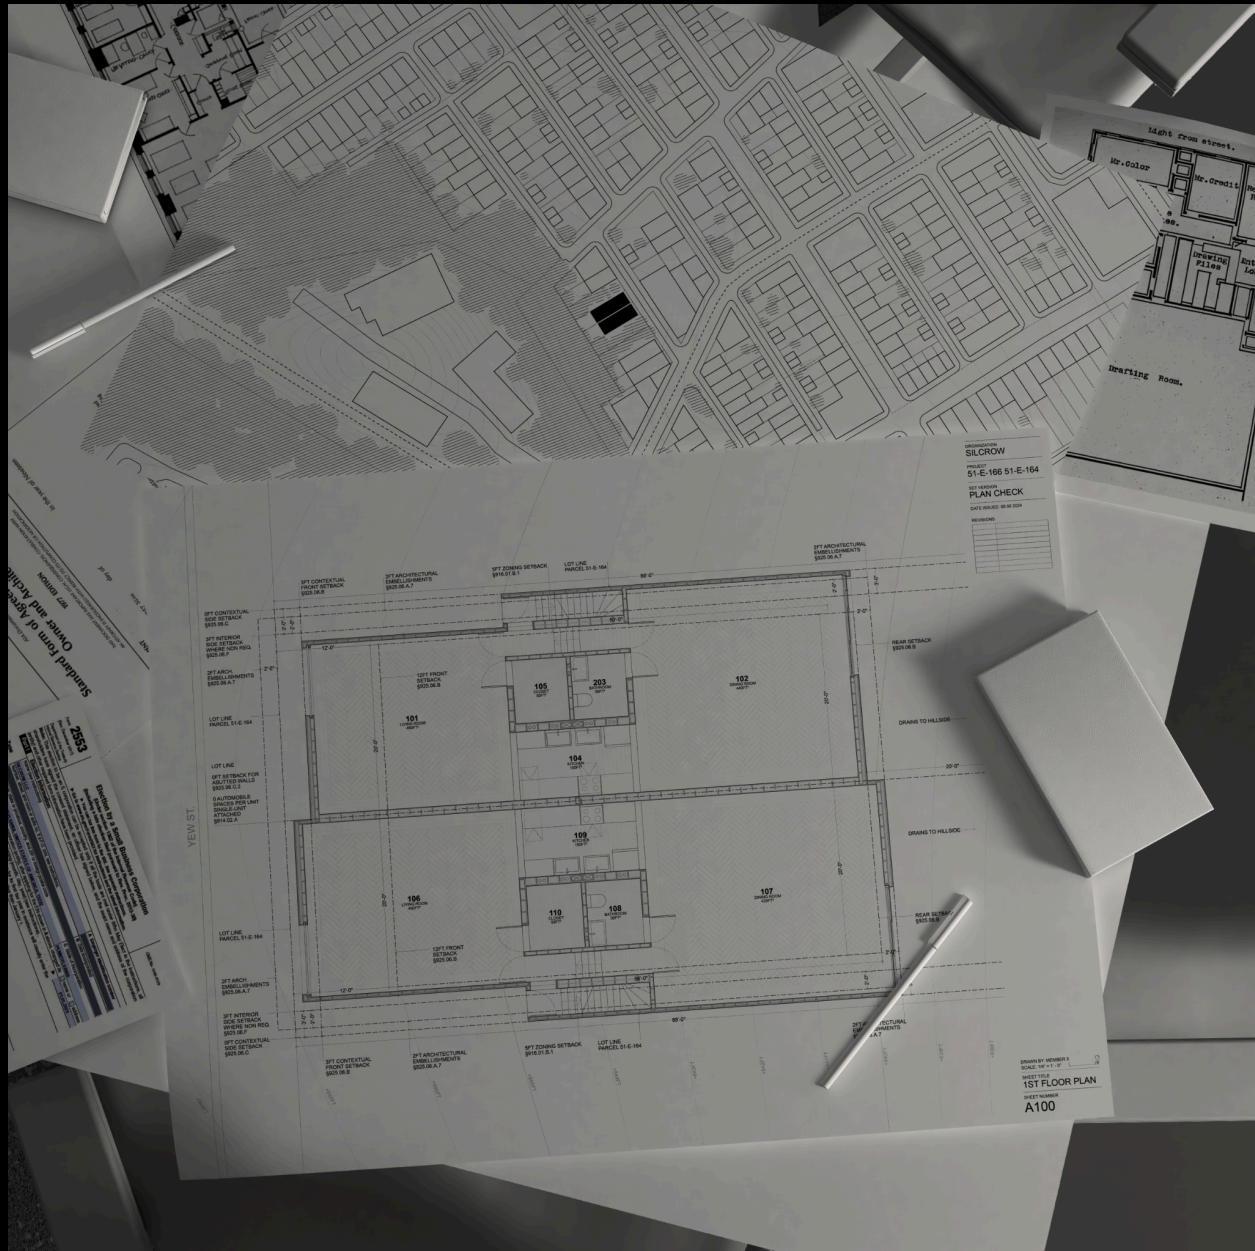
Site Plan and Ground Floor Plan as Shown in the Permit Set
